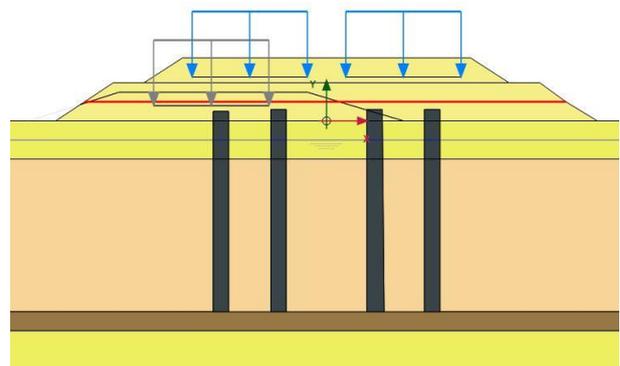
FEM model for B section with Trenchmix panels: the last phase, new-build rail embankment with live loads.
